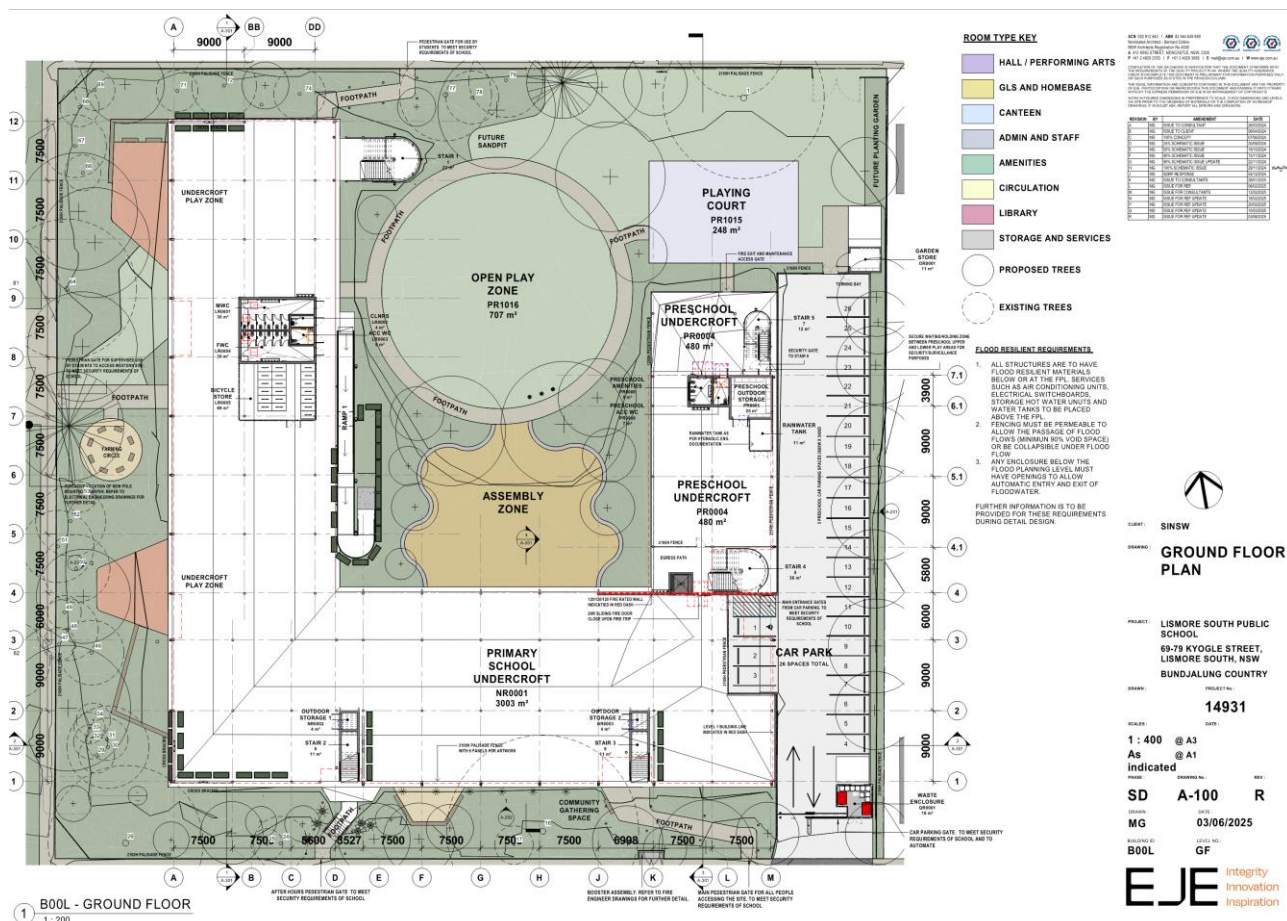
Proposed Ground Floor Layout (Source: EJE Architecture)
